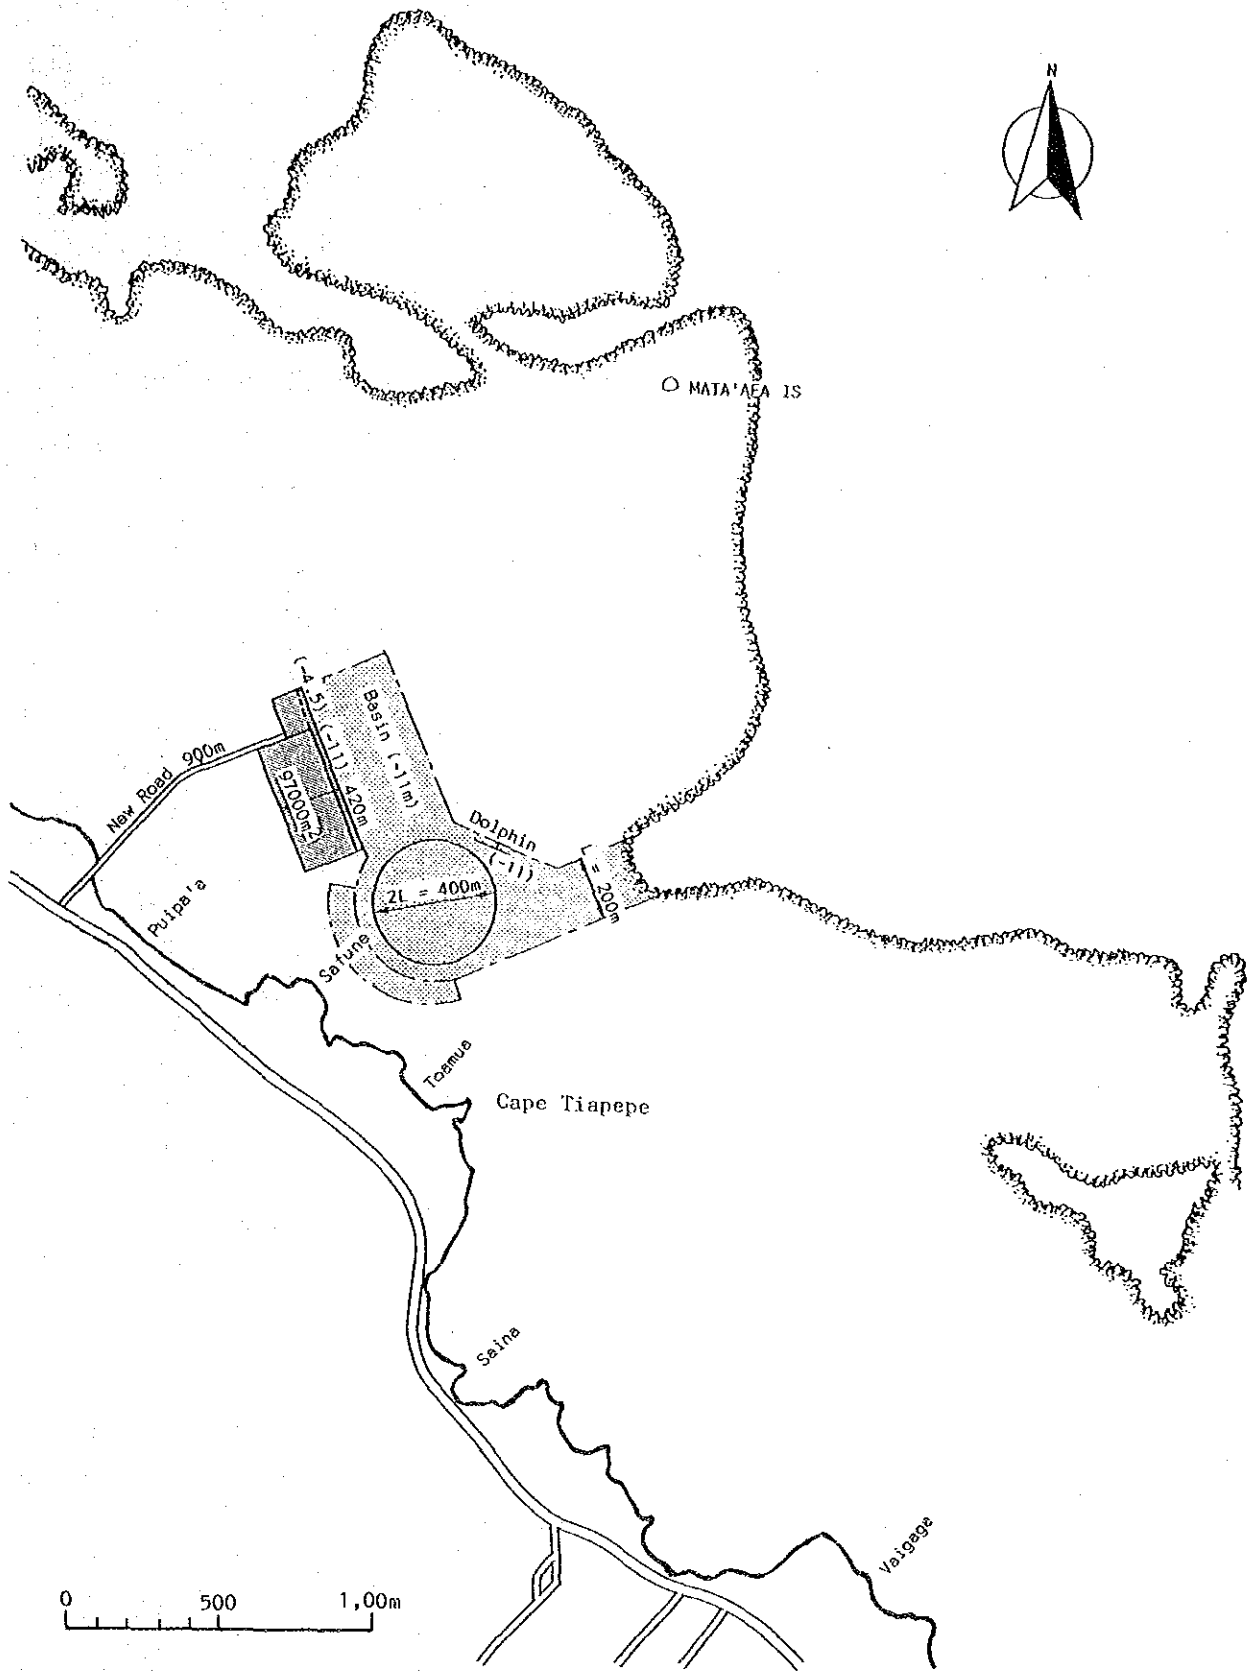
Layout of the Port Facilities (Alternative 2)
